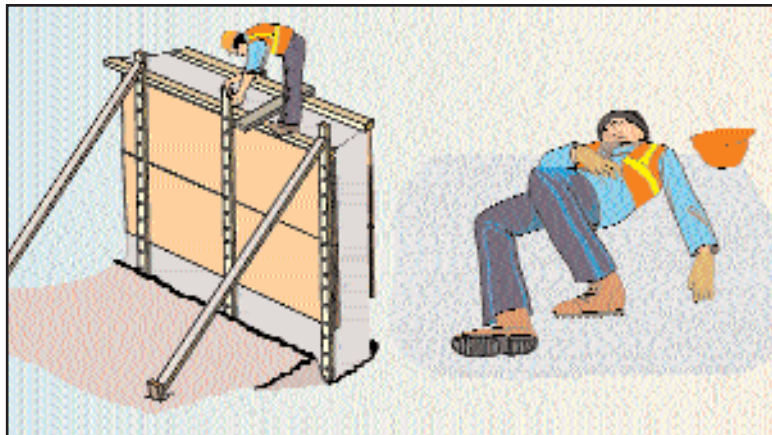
B. In road work, there are some falls from elevations. Even falls from a few feet can kill. OSHA requires fall protection for work at 6 feet above any surface.
